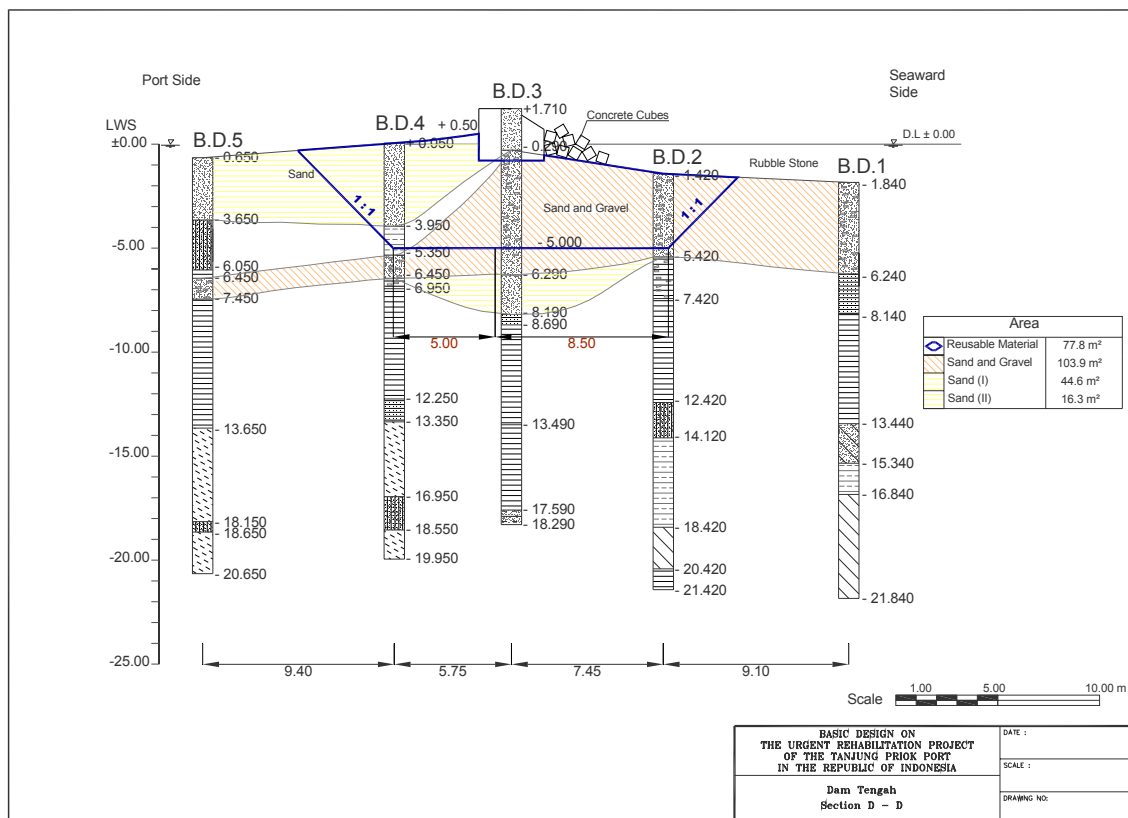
(3) Excavation Section shown with Boring-Log in the Segment 3
